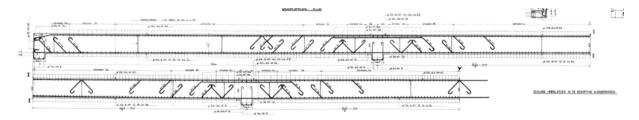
Longitudinal view of reinforcement showing hooks at the end of the longitudinal bars. Dimensions in cm, except for bar diameters in mm.
